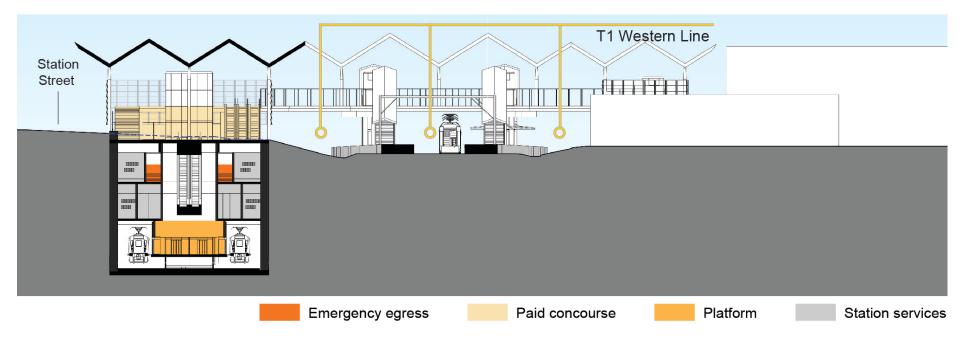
Cross section of St Marys station box and aerial concourse (facing west).
